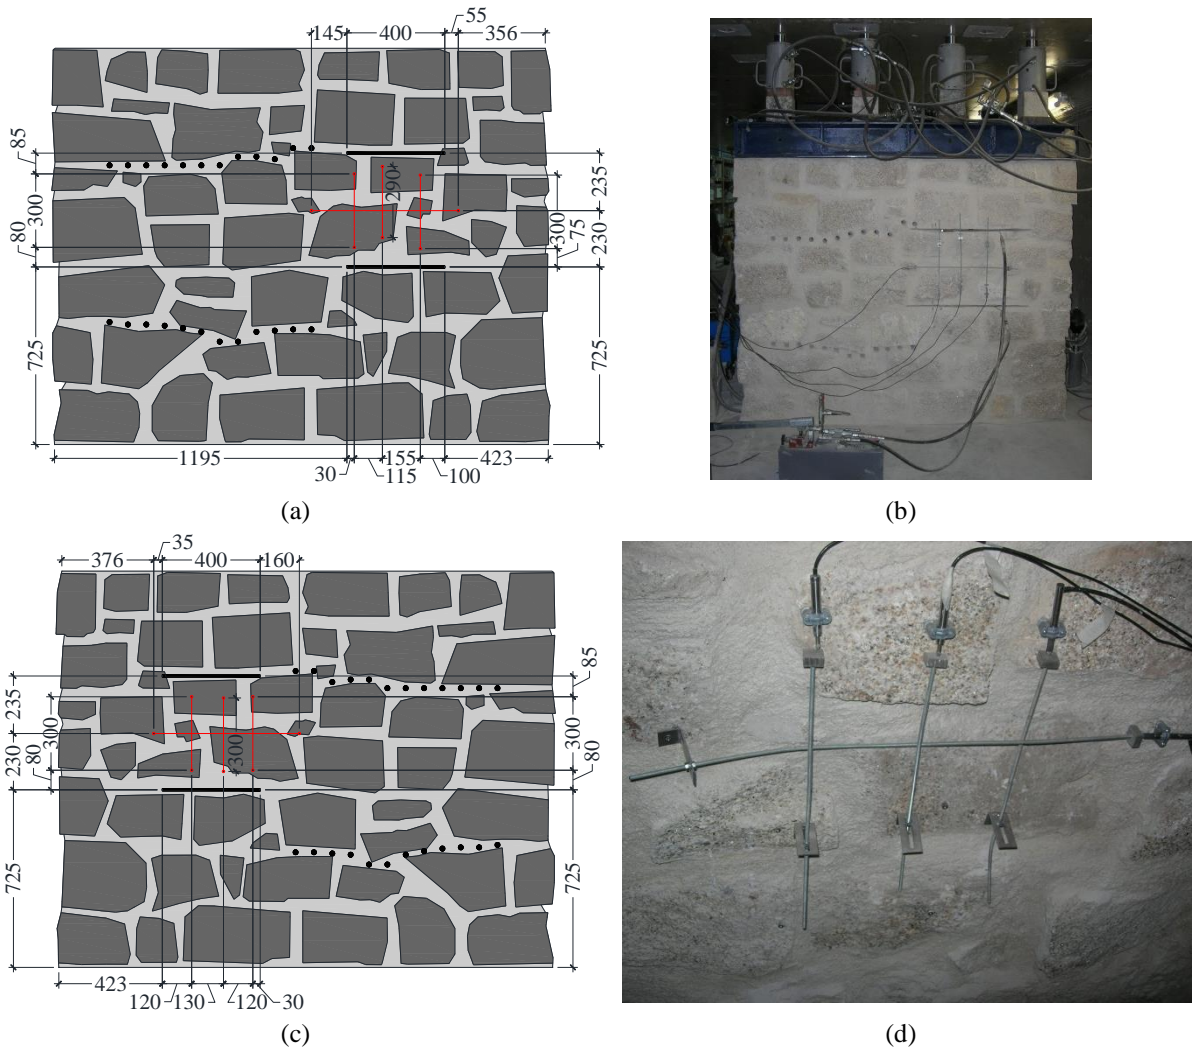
Arrangement of LVDTs for the double flat-jack test on the irregular wall: measuring distances on (a) the front of the wall and (c) back of the wall; and photos of LVDTs attached to (b) the front of the wall and (d) the back of the wall
